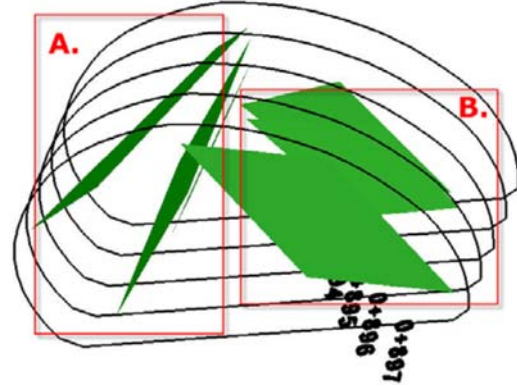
Fractures parallel to the tunnel line (A type fractures) and crossing the tunnel line (B type fractures). See details in text.
